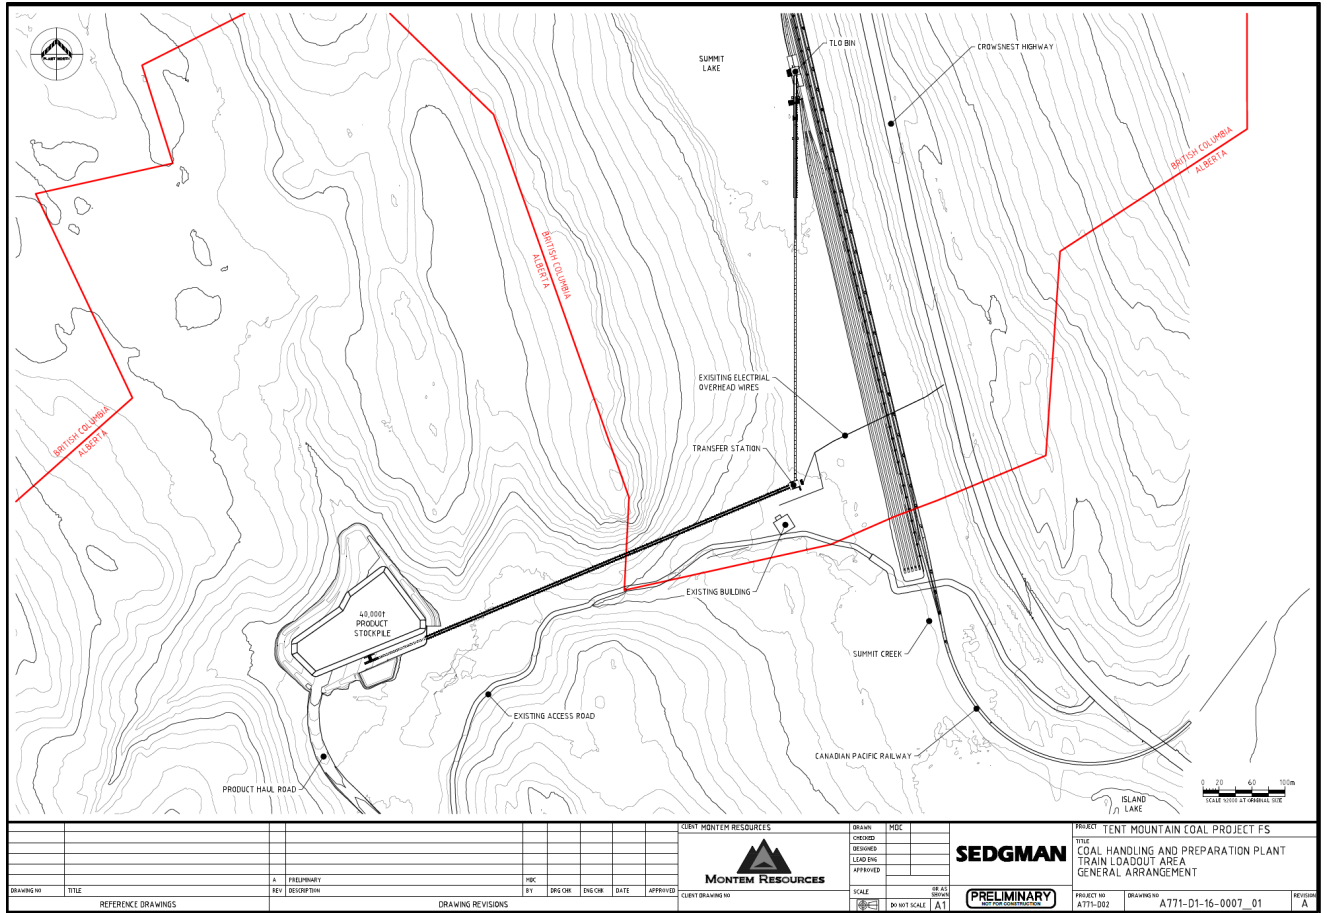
Illustration and location of potential Tent Mountain Mine Loadout.
